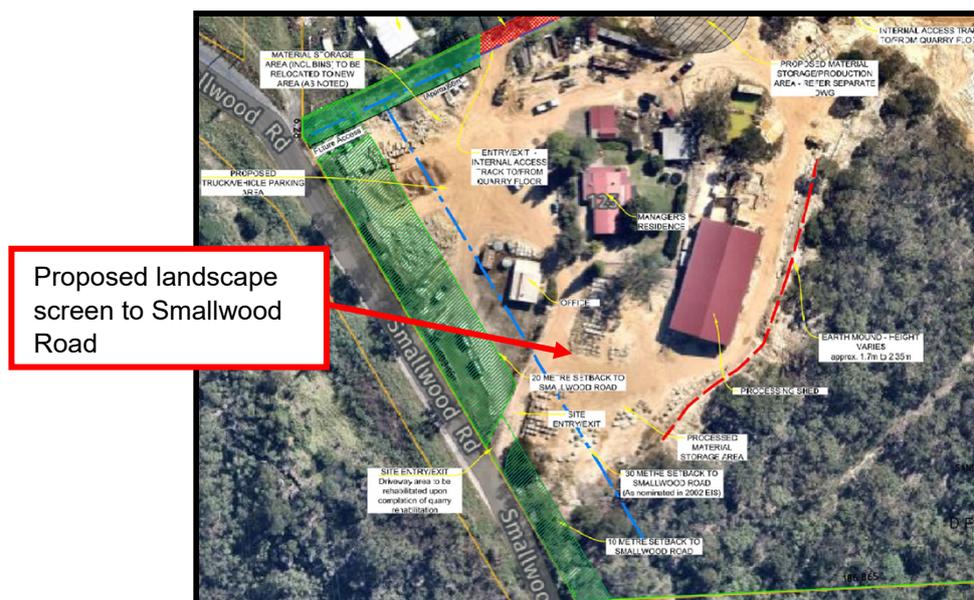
Proposed setback to Smallwood Road (Source: Part Site Plan/Admin Area, PGH, Rev B 29 June 2023)
